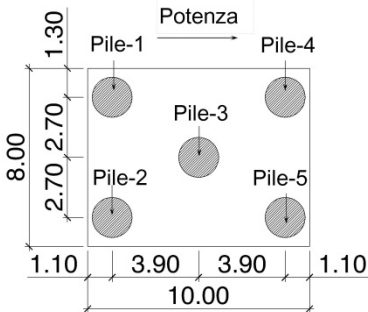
Elevation layout of abutments in 'Viadotto Serrone' (Unit: m)
